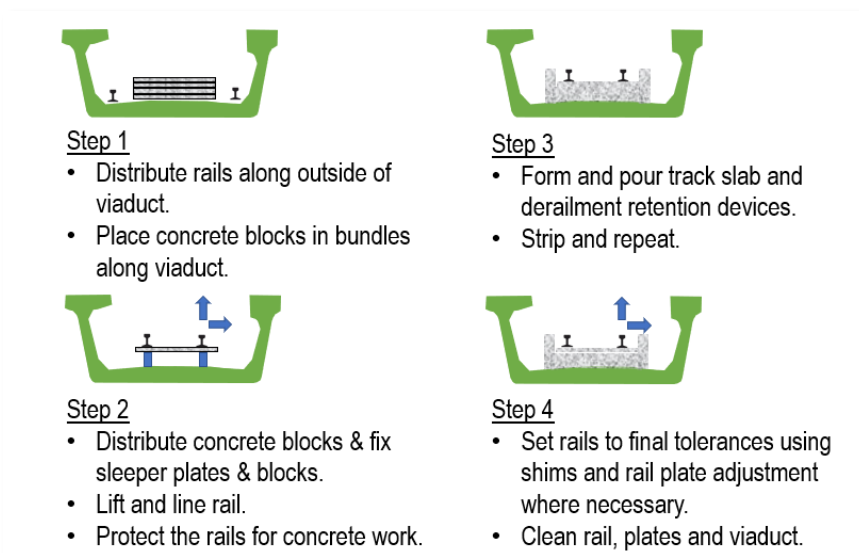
TRACK SLAB CONSTRUCTION STAGING
